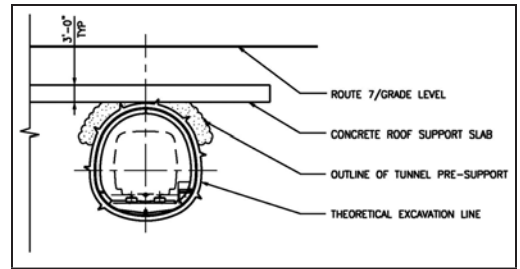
Top-down slab tunnel pre-support concept for shallow tunneling
